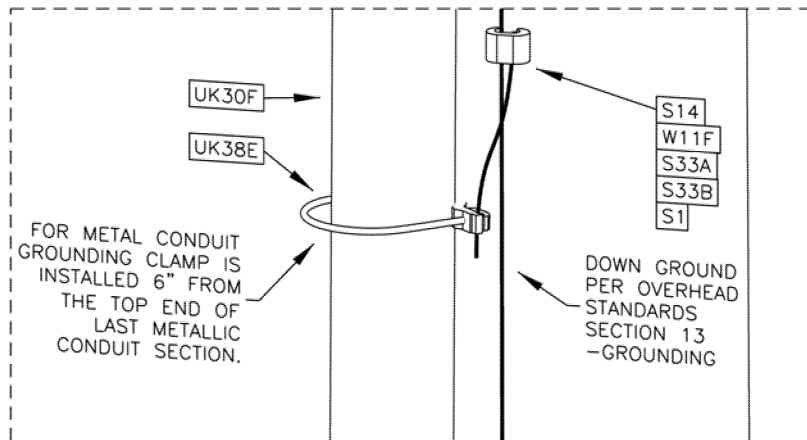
GROUNDING DETAIL FOR GALVANIZED STEEL RISER CONDUIT
